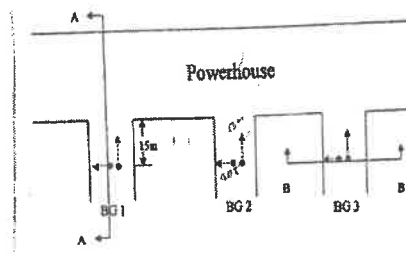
Schematic diagram of the power house showing location of extensometer in bus-gallery plan view
